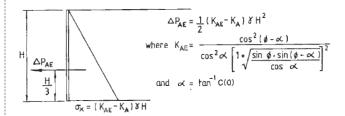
Wood and Elms 'Flexible' Loading Diagram (taken from Seismic Design of Bridge Abutments and Retaining Walls, 1990)
